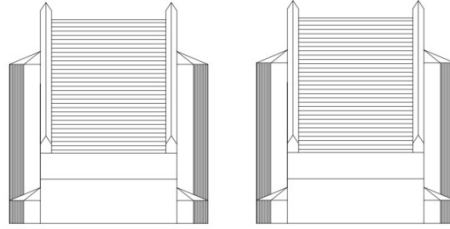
Elevations of Mughal Bridge (E.g. Mirkadim Bridge)
